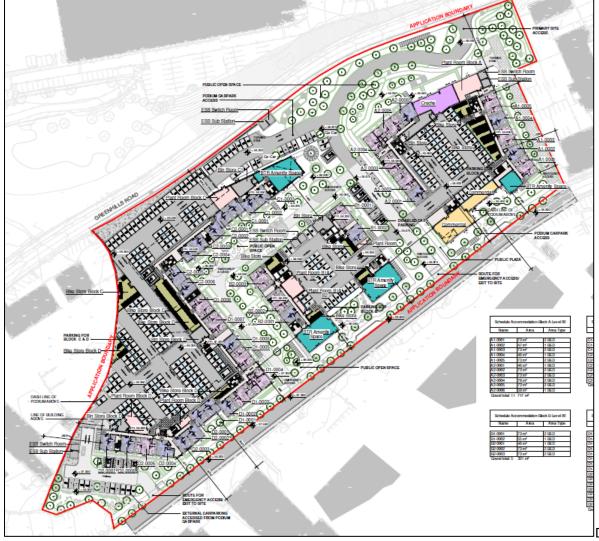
Site Layout Plan as submitted for Stage 2 SHD Consultation Meeting
